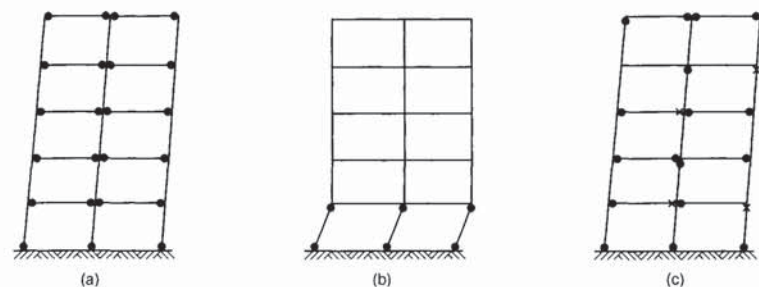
Plastic collapse mechanisms: (a) beam sway; (b) column sway (soft storey); (c) mixed mode
